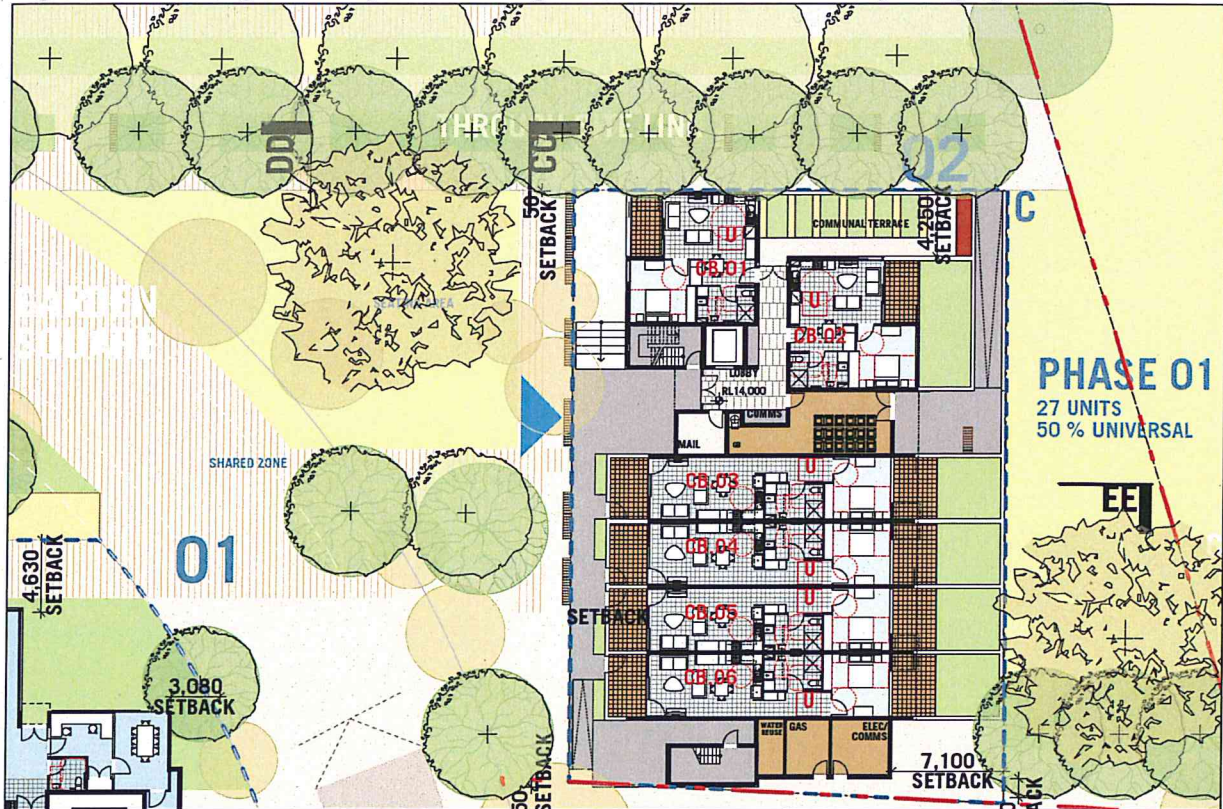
Building C site layout including communal terrace and adjoining open space areas
